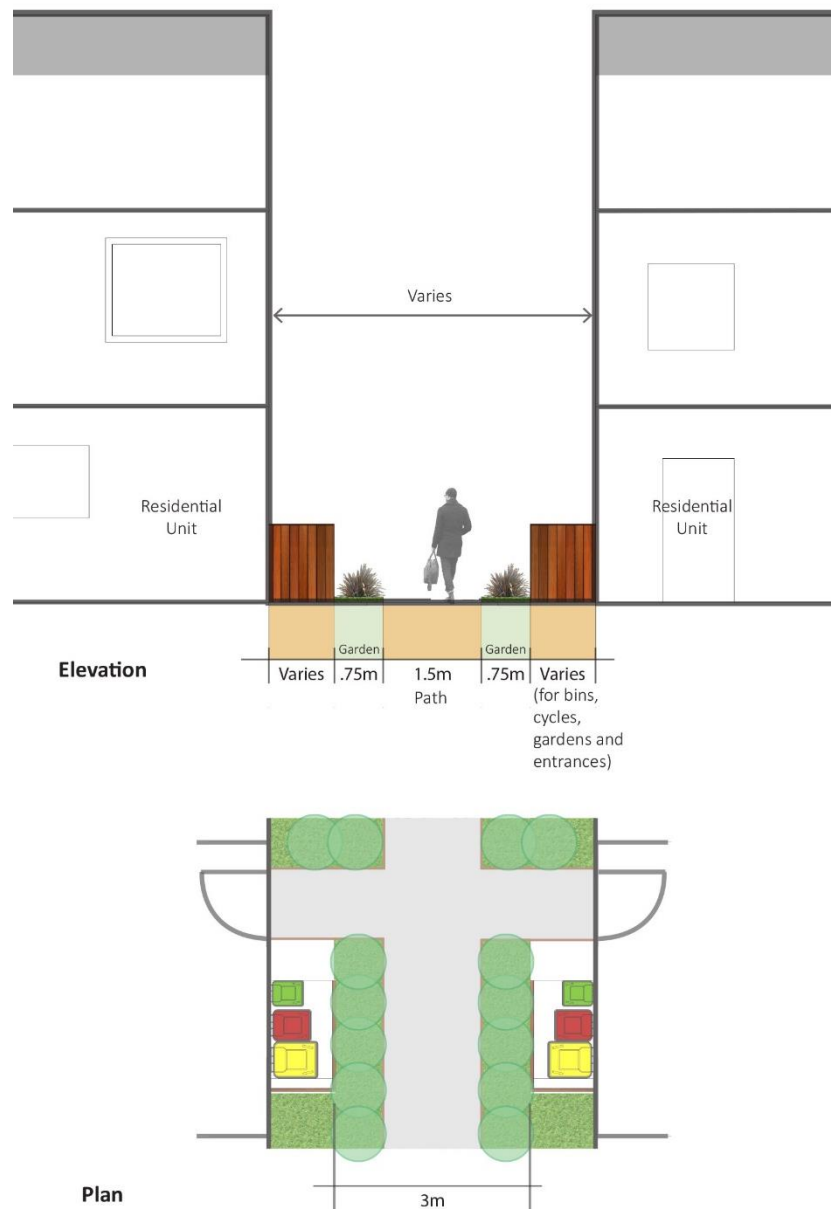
Typical cross-section and plan showing how pedestrian access way could be provided as a minimum.
